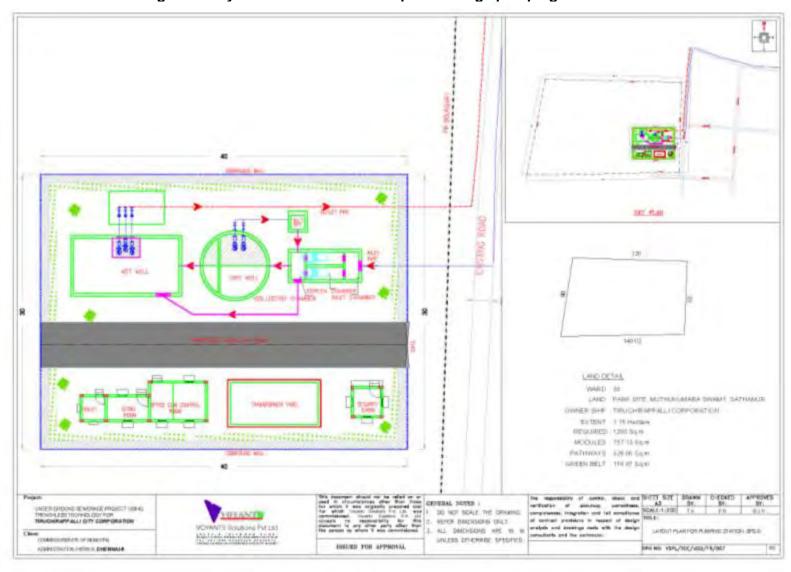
Layout Plan on revenue map for Sewage pumping stations 9
